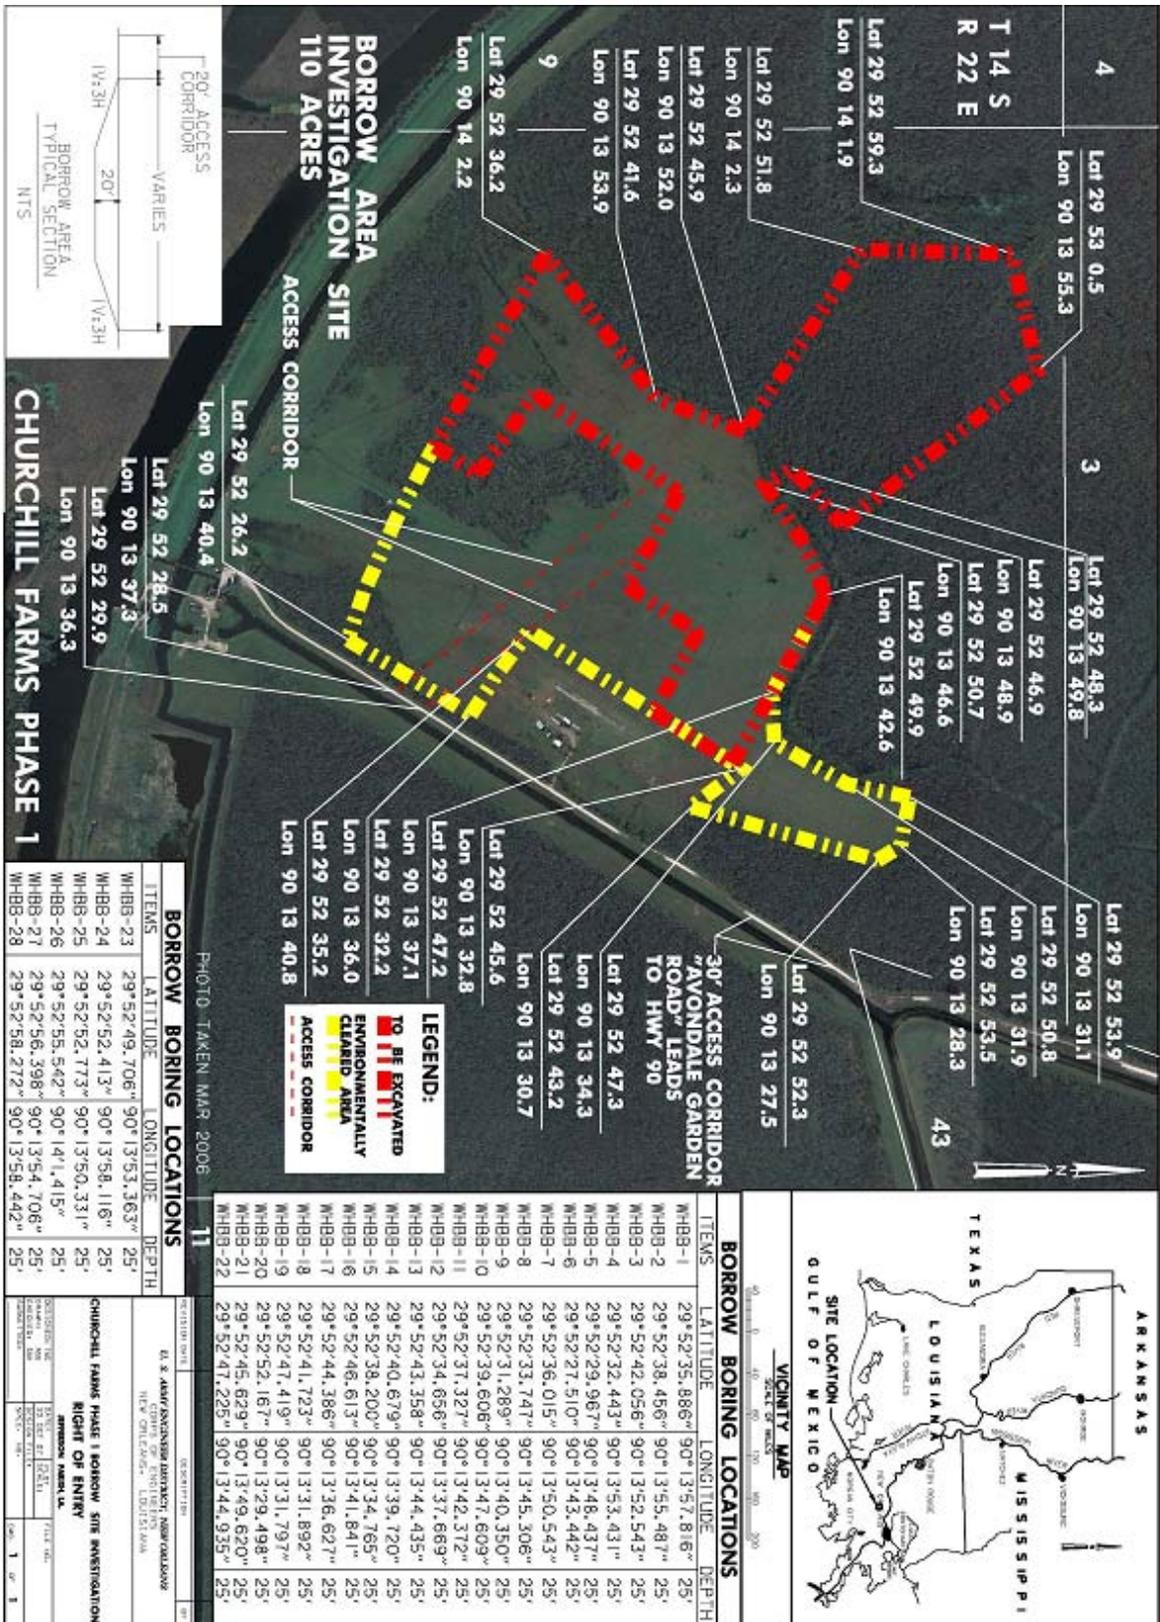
Churchill Farms Pit A Proposed Borrow Area
